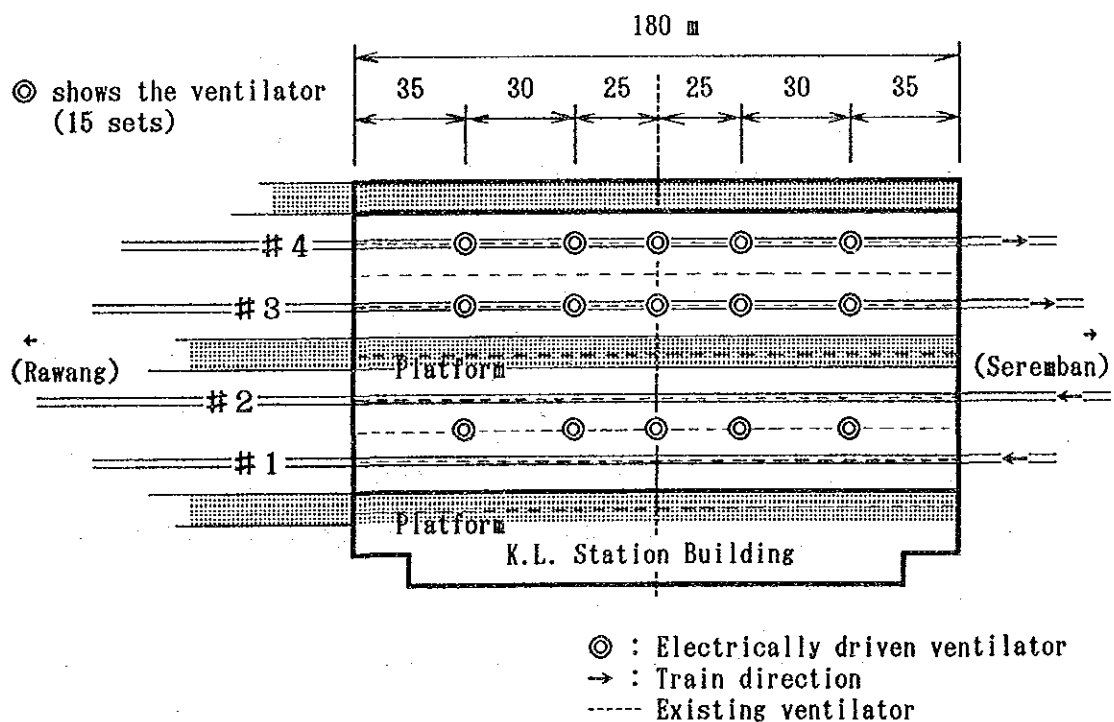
Installation Plan of Ventilators at K.L. Station
